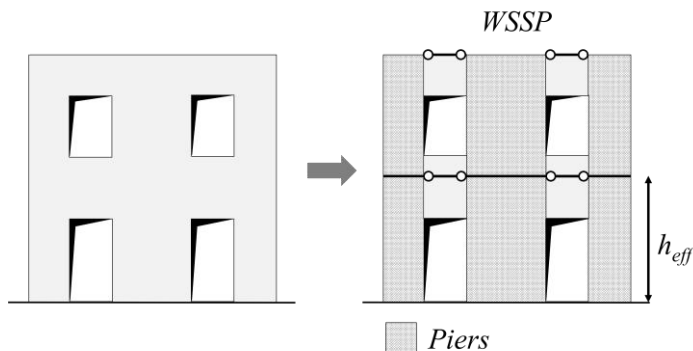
Modelling of a masonry wall through WSSP (weak spandrels-strong piers) simplification
